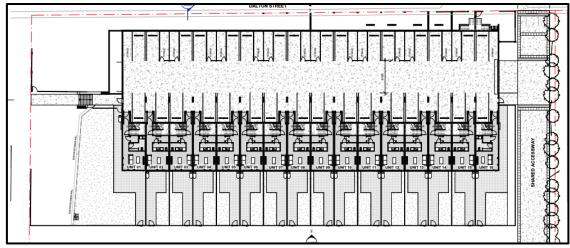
Floor Plan (Excerpt) - Basement and Ground Floor
